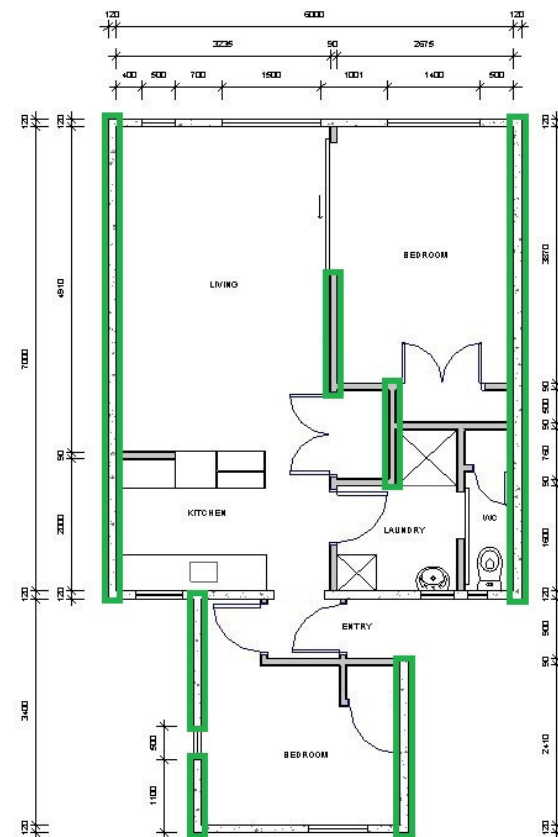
Walls used for bracing in the transverse direction, 2 bedroom unit.
